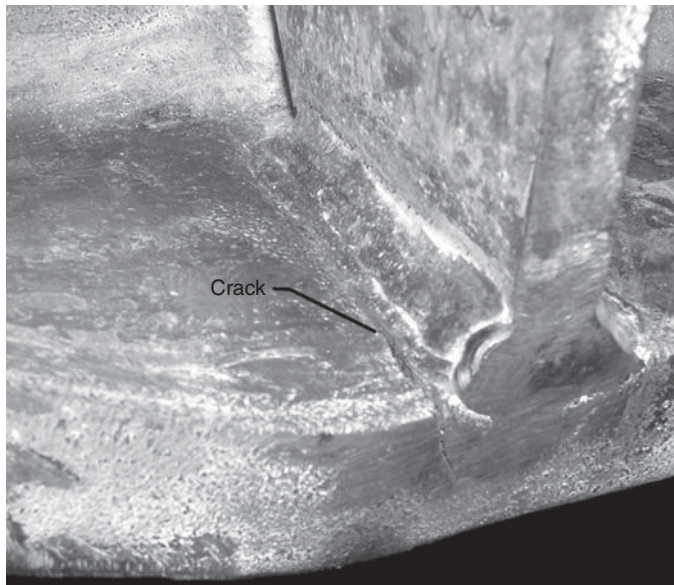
Crack at Stiffener 2 on Specimen 1D/R-1.
